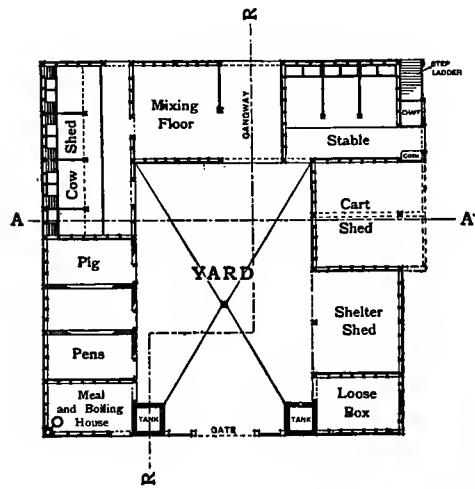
Arrangement of Buildings for a Small Holding of 70 acres
